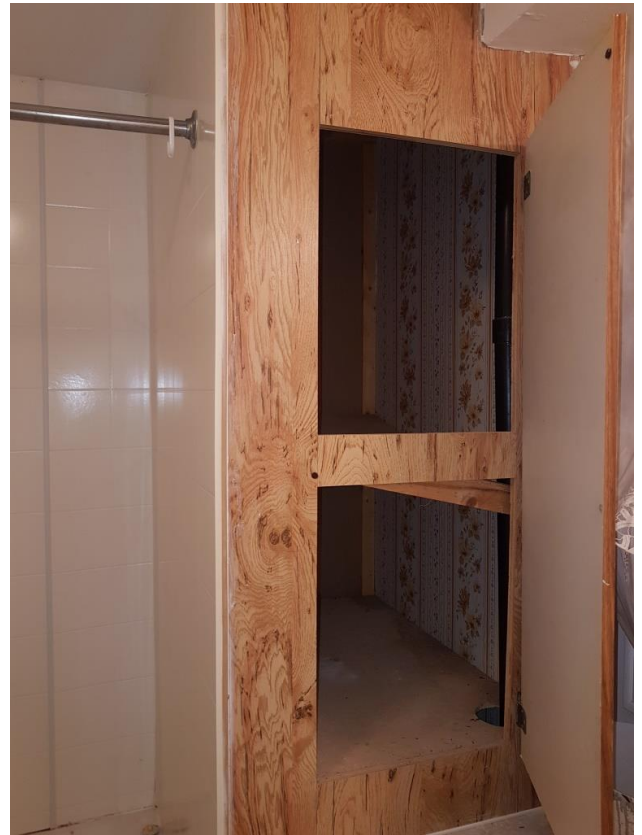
Trailer, Bathroom Storage Closet (Note plumbing vent pipe)
